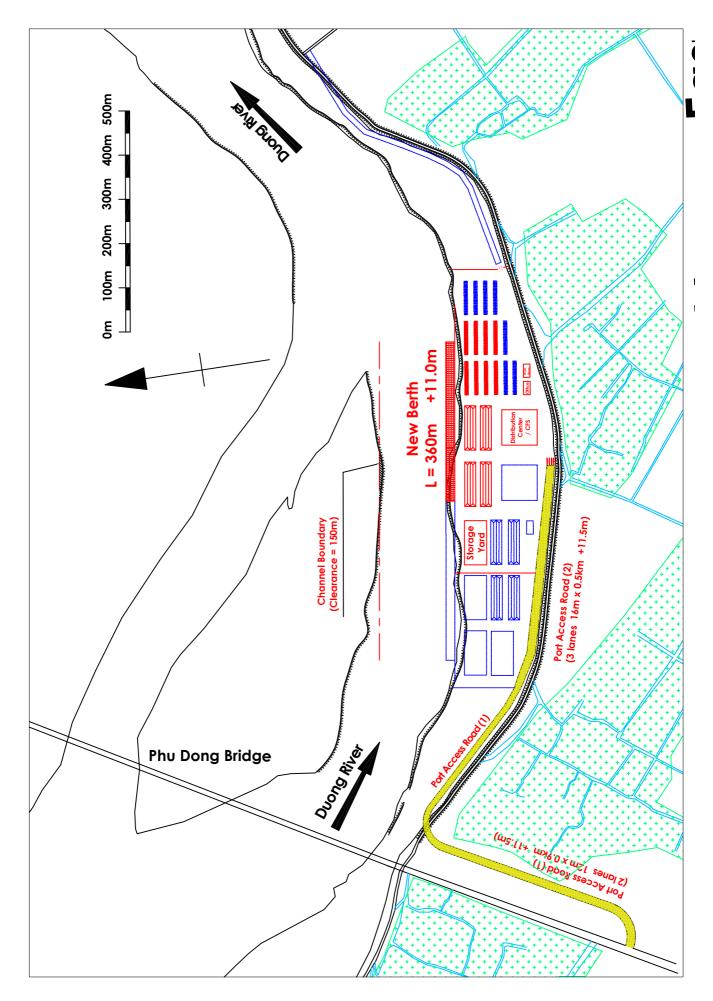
Short-term Development Plan of New East Port (2010)
